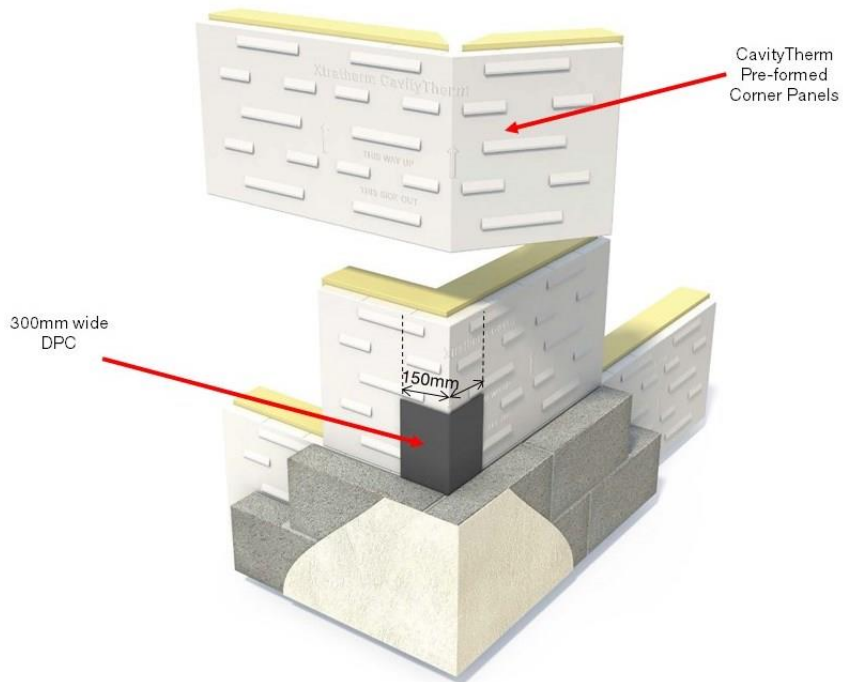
Installation Detail at Corners Including Unilin Pre-formed Corner Panels.
